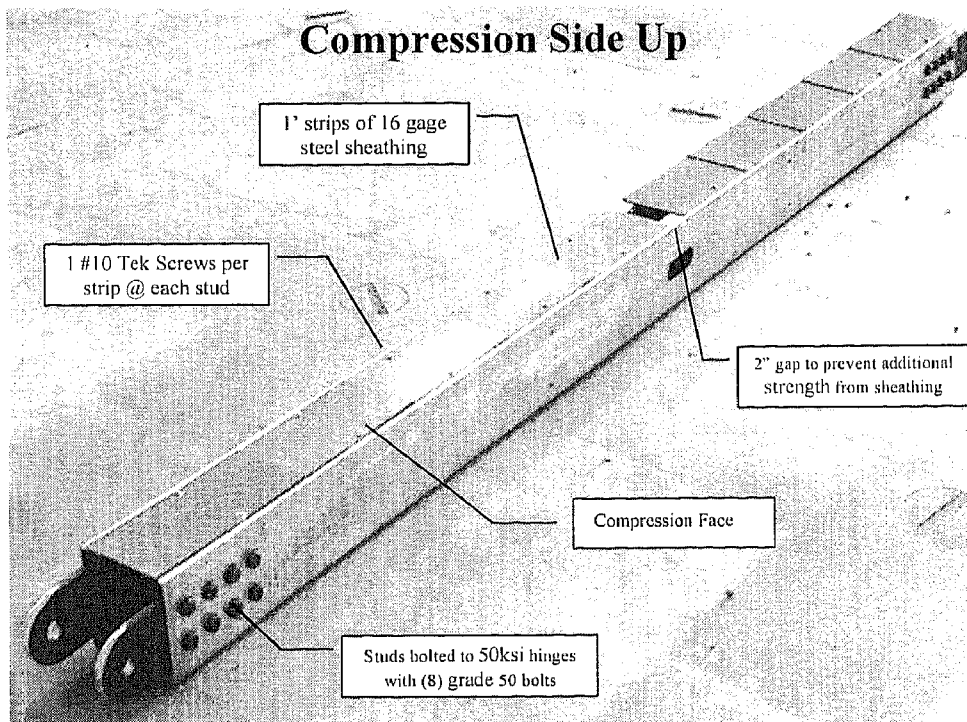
Fully Constructed Steel Hinge Test Specimen (Compression Face)
